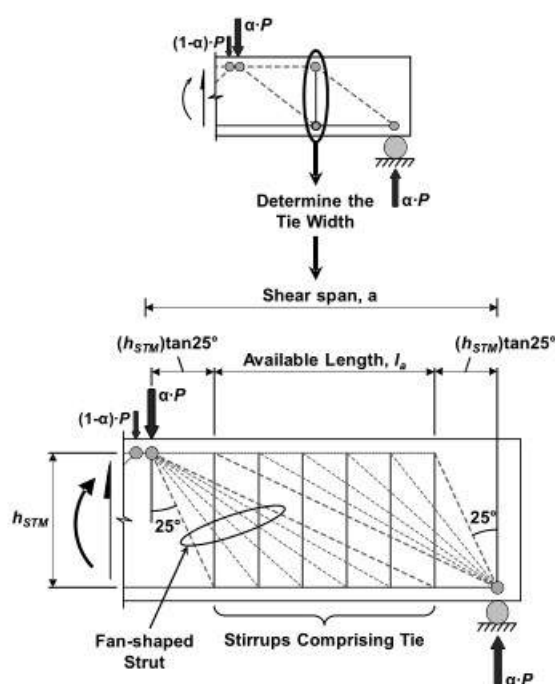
Fan-Shaped Strut Engaging Transverse Reinforcement Forming a Tie
